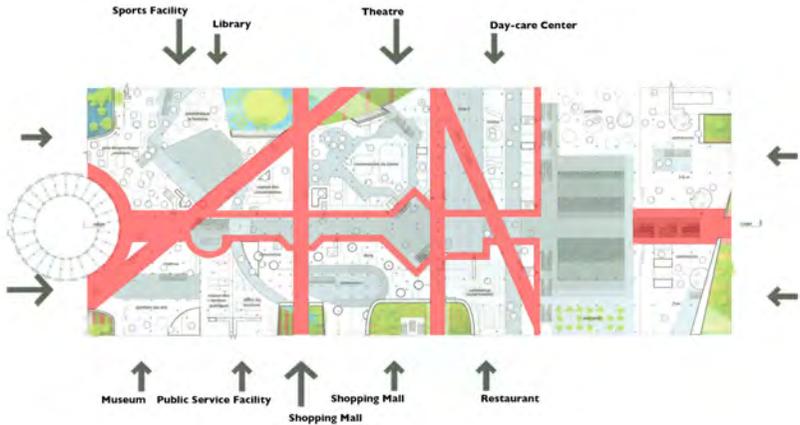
The First Floor Plan: Main Axis and New Pedestrian.
